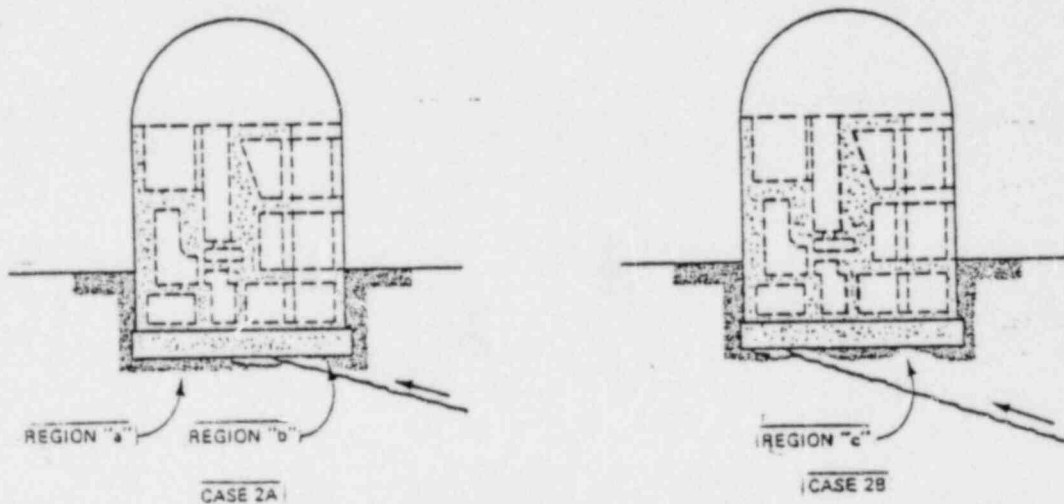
CASE 2 - POTENTIAL FOR LOSS OF LOCAL FOUNDATION SOIL SUPPORT
